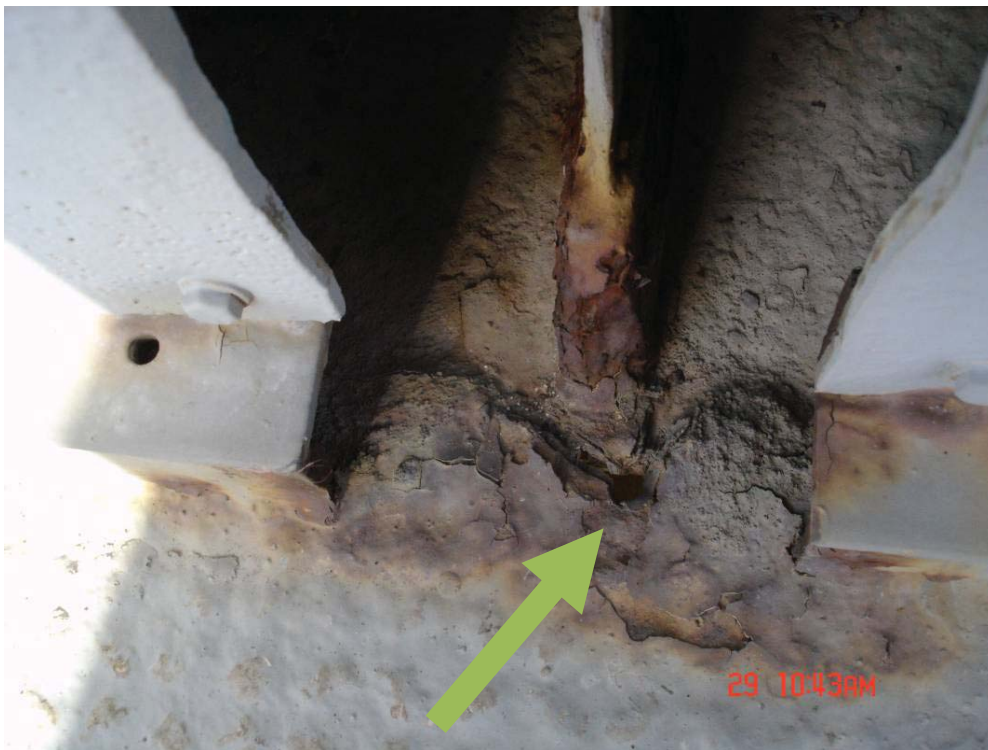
Floor Plate Corrosion around Drum Support Bearing Stiffener Hole
